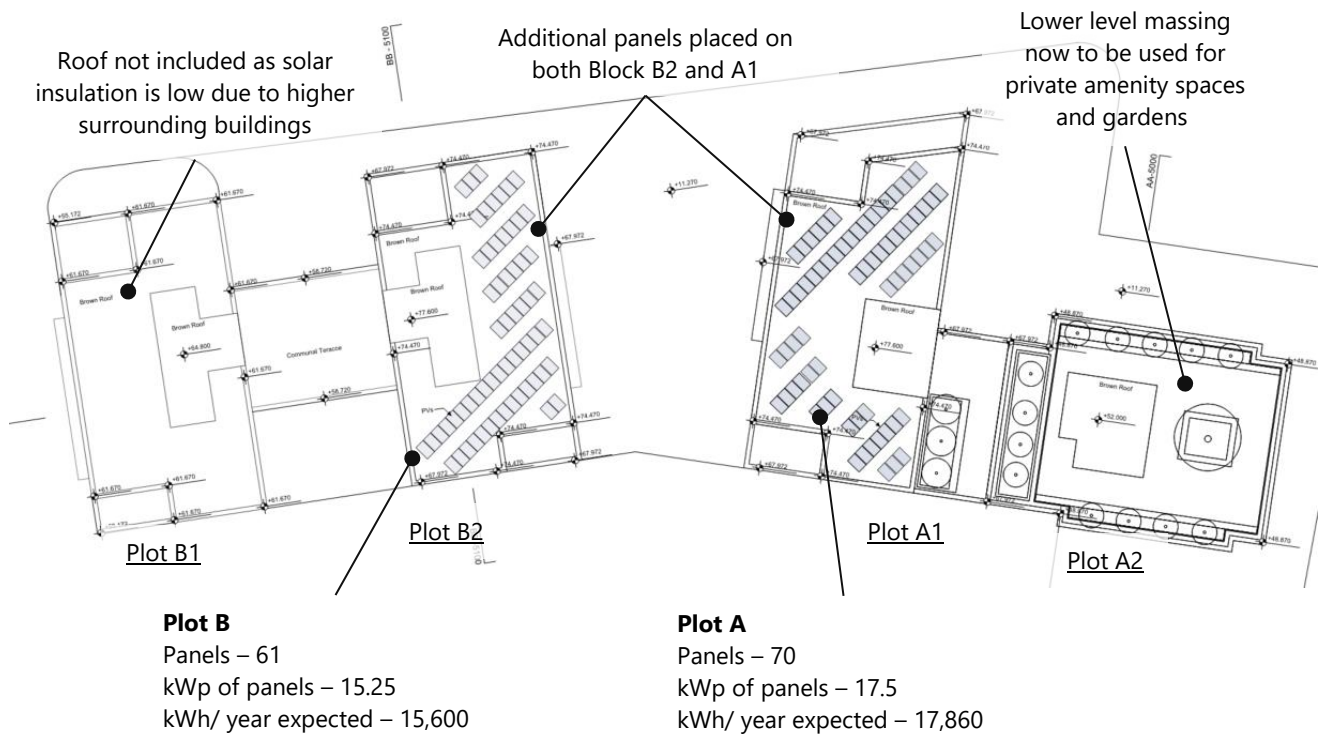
1 the detailed PV layout for the roofs of plots A and B as based latest massing
